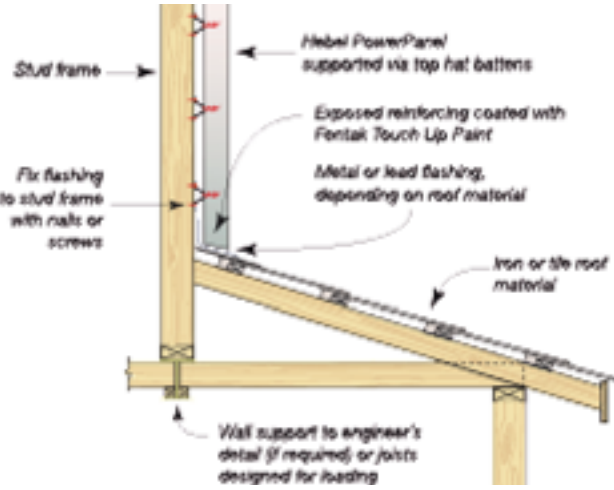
Roof to Wall Junction Detail - Option 2
